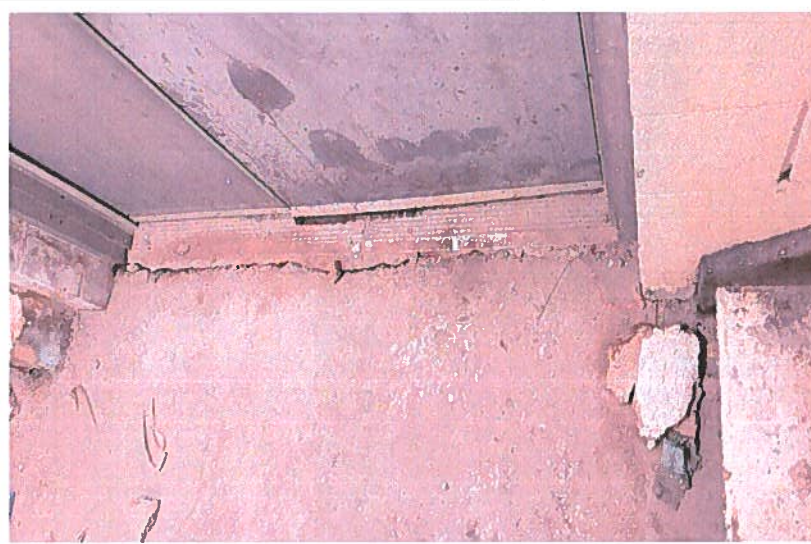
Slab-On-Grade Damage in West-Side Stairwell
